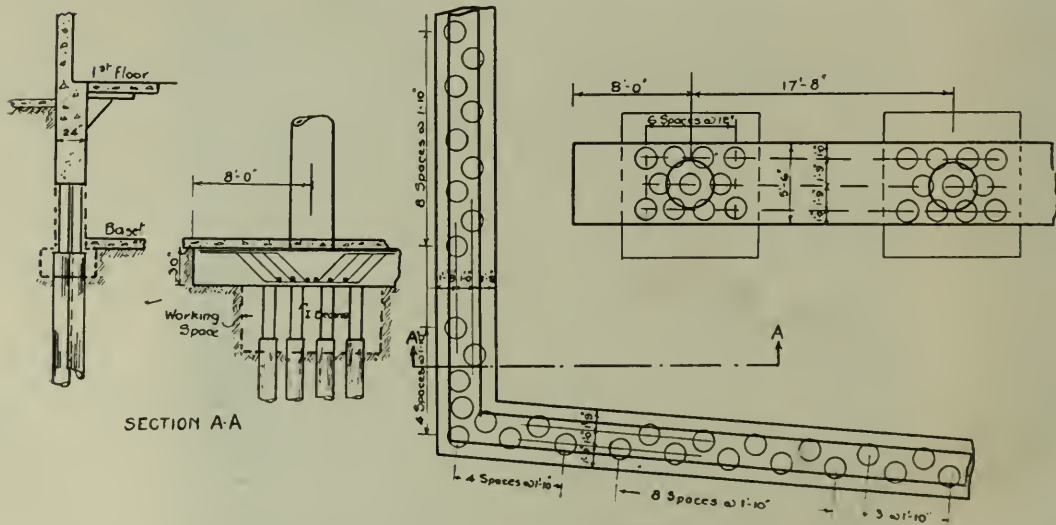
PART PLAN OF FOUNDATIONS (Showing Pretest Piles)
